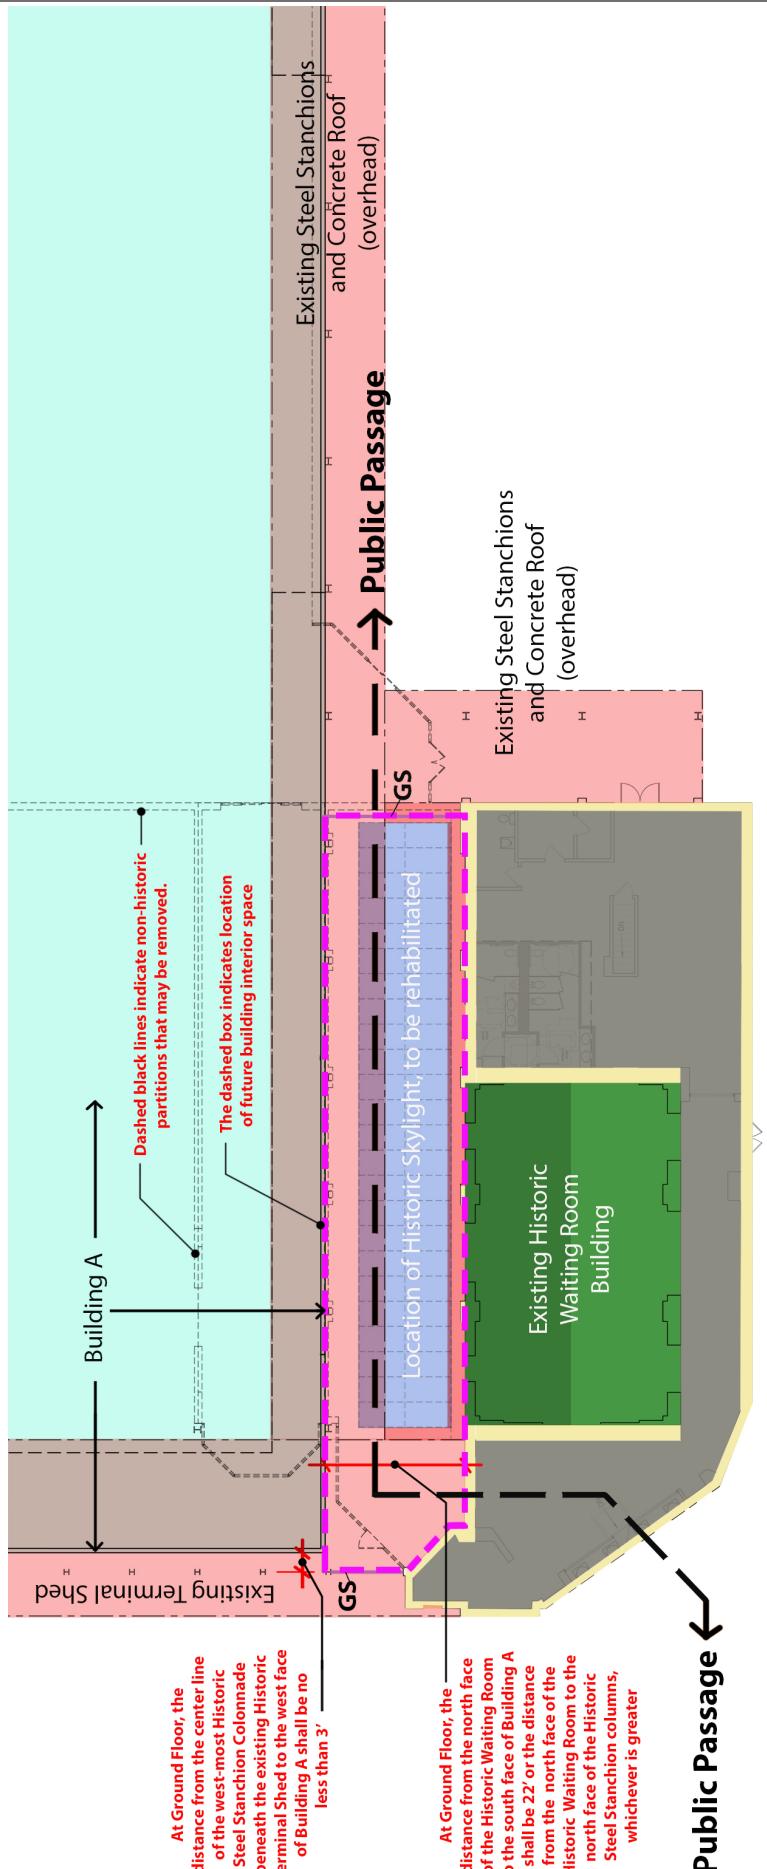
SETBACK REQUIREMENTS FOR HISTORIC WAITING ROOM AND BUILDING A | Lackawanna Plaza Redevelopment Plan | Township of Montclair, NJ
